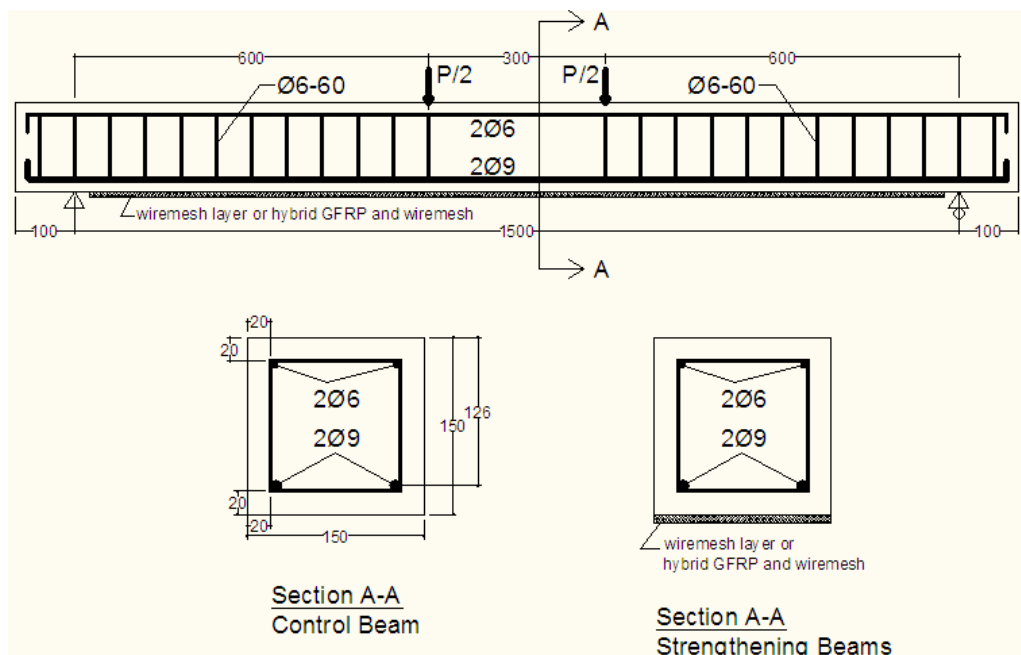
Simply supported beam under four point bending. Section A-A shows control beam section and beams with strengthening system.
